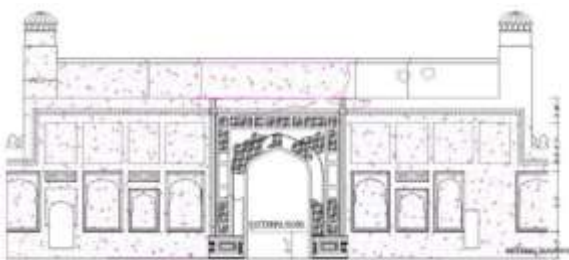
East Elevation of Main Entrance gateway of Shalimar Garden
